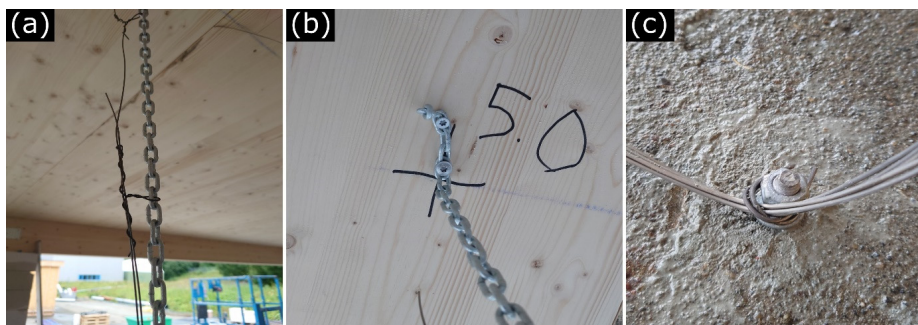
(a) The TC trees were attached to a chain, (b) fixed to the ceiling by two 120 mm long screws, and (c) anchored to the concrete floor by an expansion bolt.
